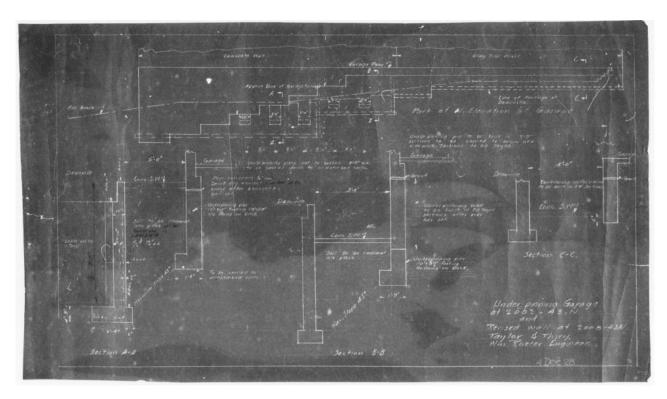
"Underpinning Garage at 2002 43N and Revised Wall at 2008 43N, Taylor & Thiry. Wm. Rueter, Engineer. 4 Dec 1928"
